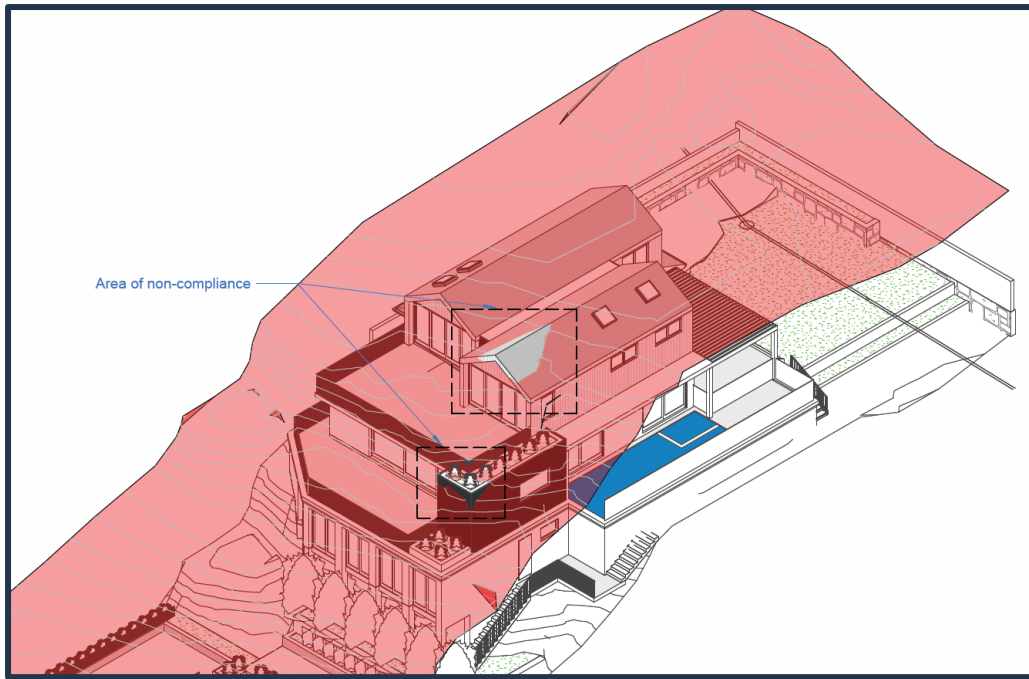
3D Height Plane demonstrating the proposed exceedance of the building height control (Source: Sachs Architecture)
